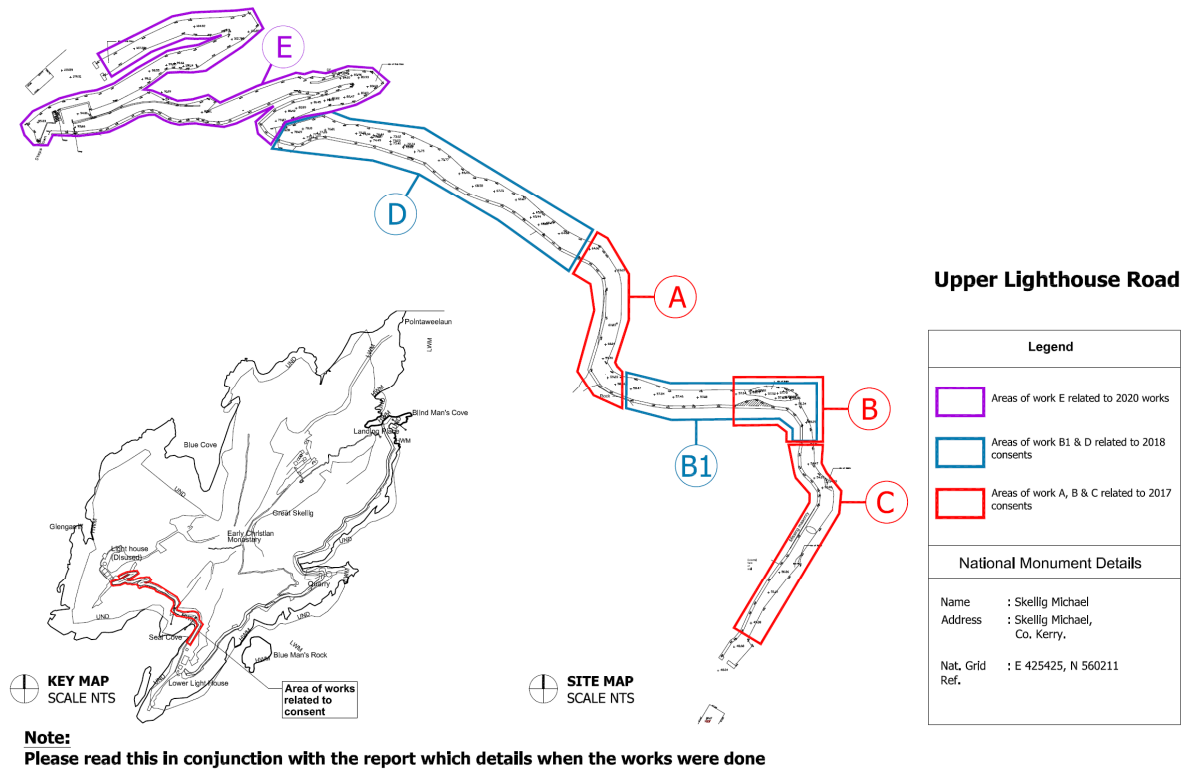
Works to Upper Lighthouse Road 2017 - 2020.
